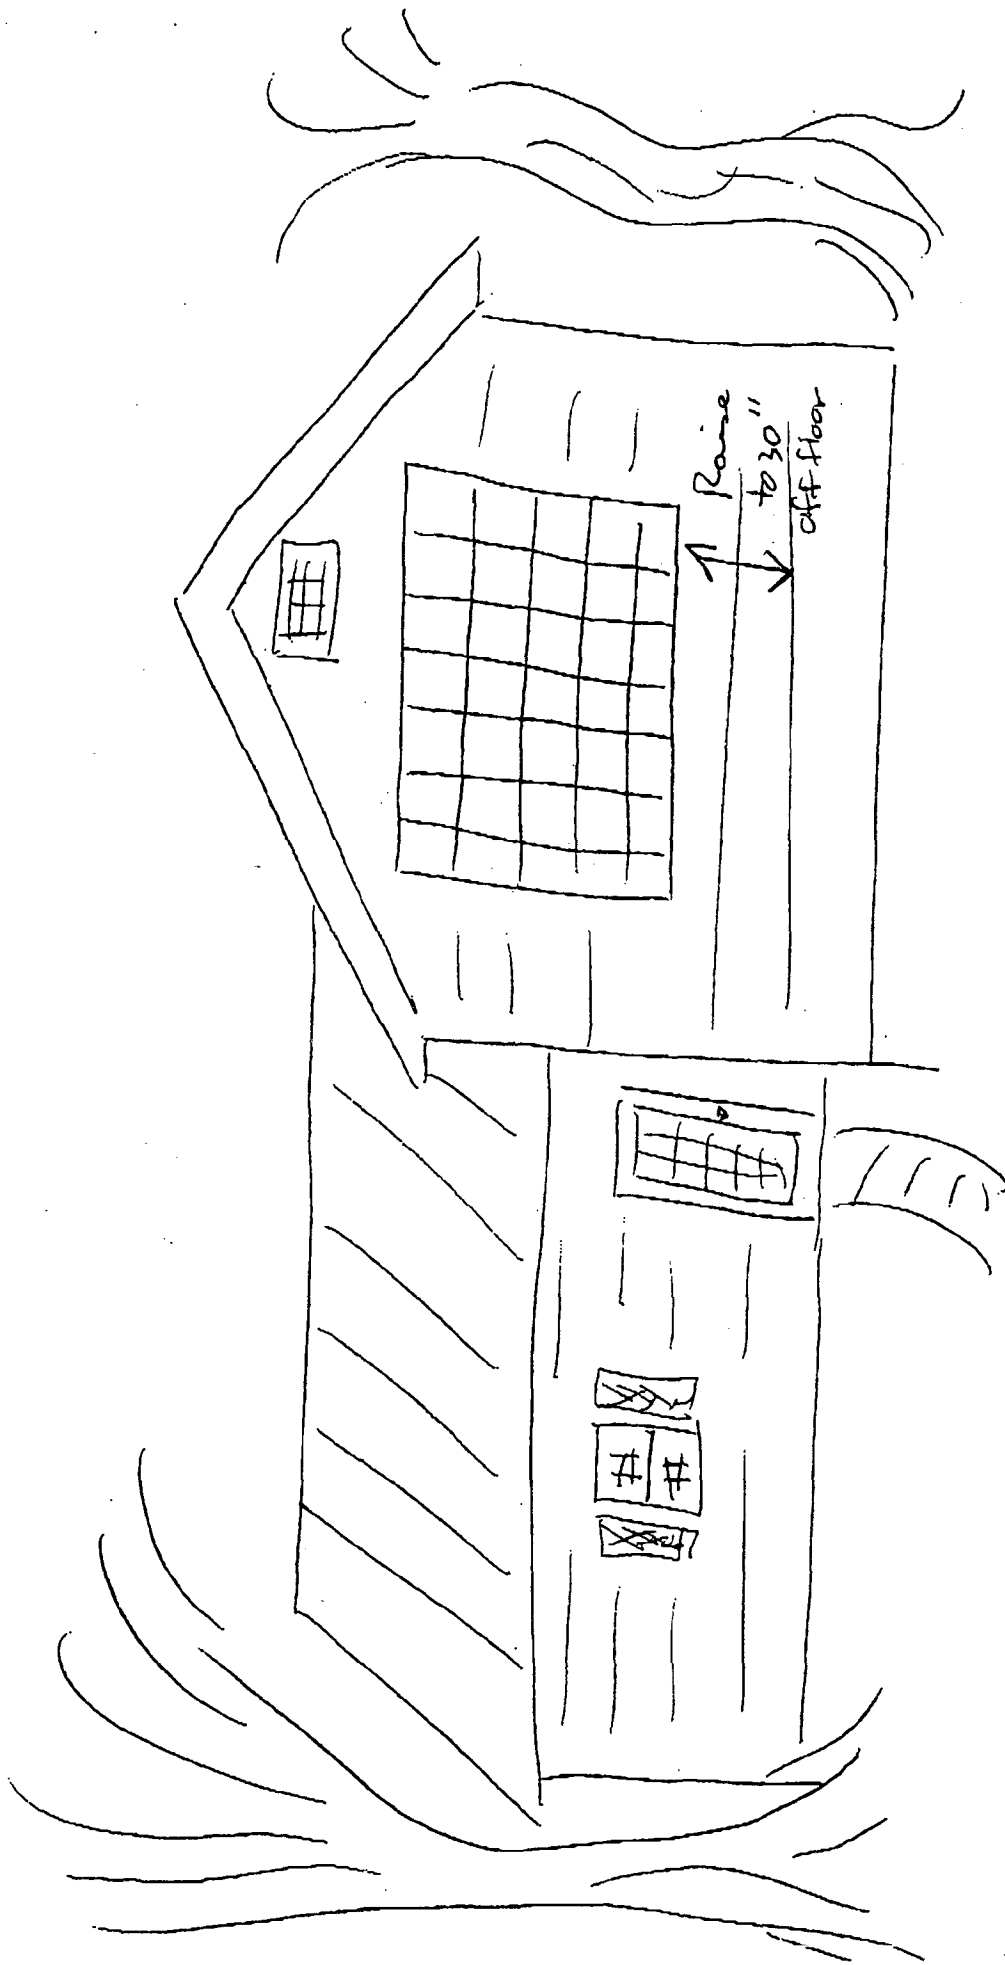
Single, fixed pane picture window in center, with double-hung windows on each side
